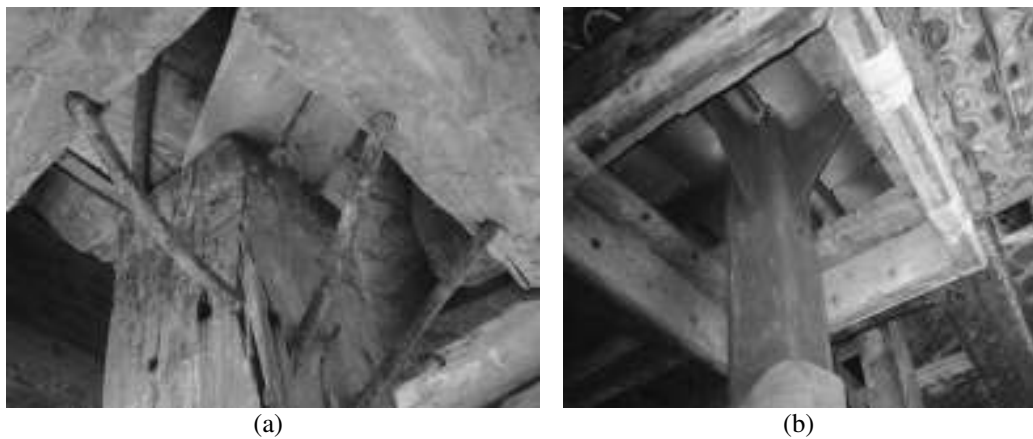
(a) The original nailed connection between the column and upper beam making a simple connection, (b) new rigid connection between the steel core of the column and new steel plate of the beam compromising the authenticity of structural behaviour
